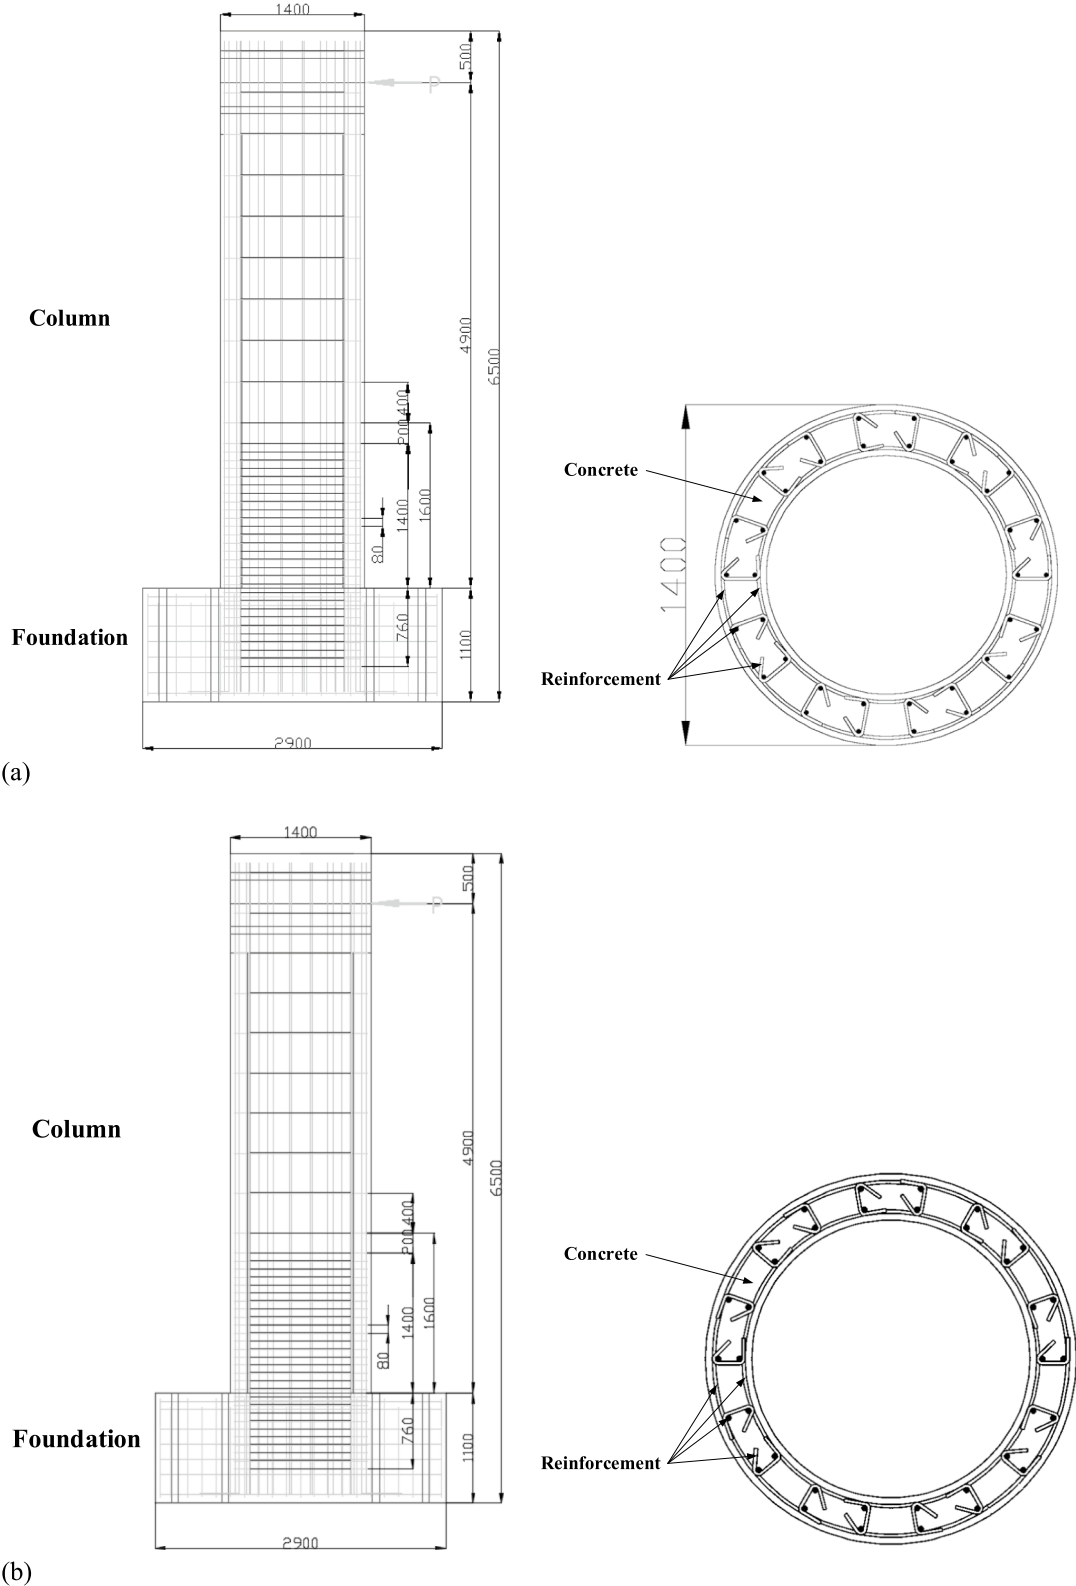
Hollow RC bridge pier specimen (Unit: mm): a HC-D1 and b HC-D2
